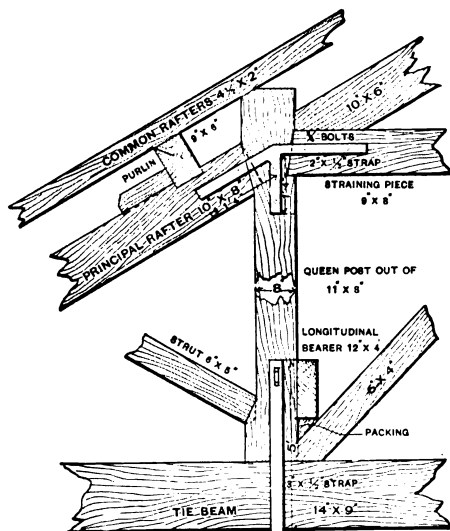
Details of Joints at B and E of Fig. 1.—Scale, ¾ Inch to the Foot.
